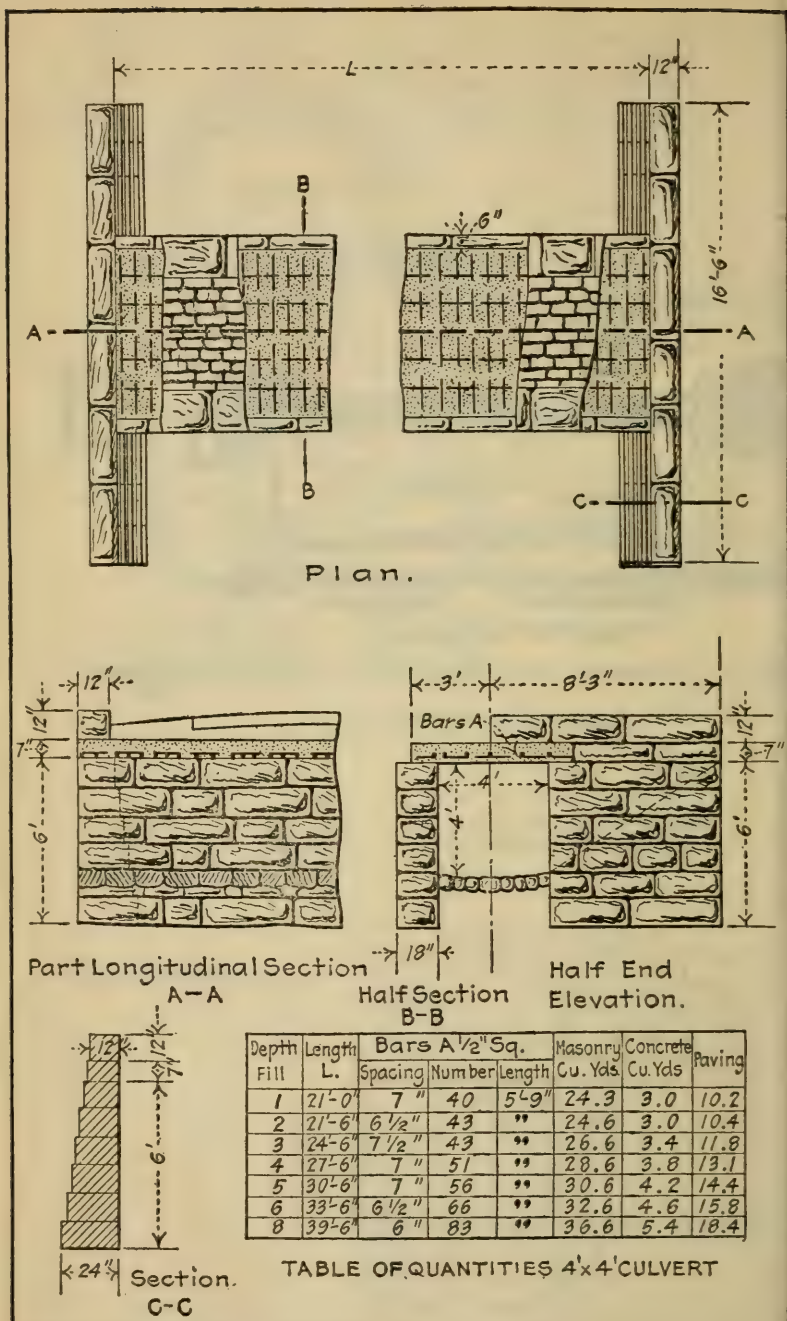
Typical masonry culvert. State of New Hampshire.
